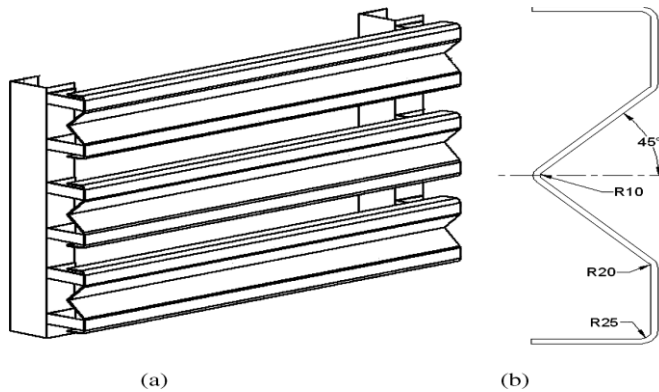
V-Beam Guardrail System and Cross Section (Reprinted from Tan et al., 2008).
